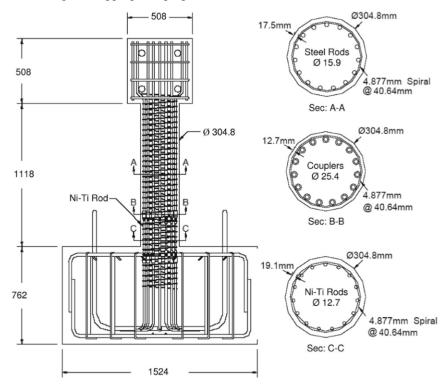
Details of SMA-RC column (Saiidi and Wang, 2006)
